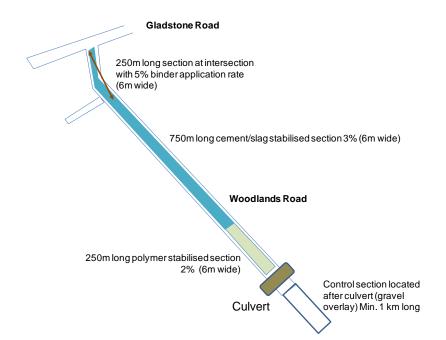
Plan view of stabilised section for Woodlands Road, Wombat.
